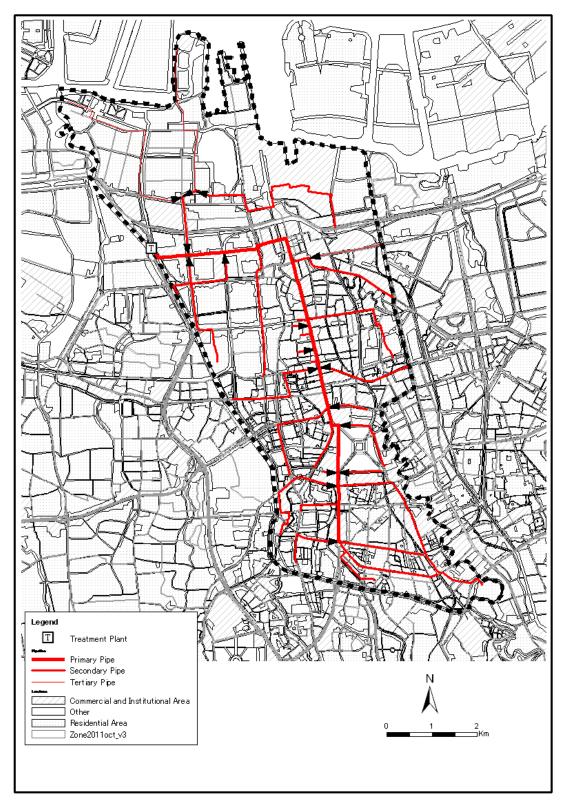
Facility Plan of Sewerage Zone No. 1
